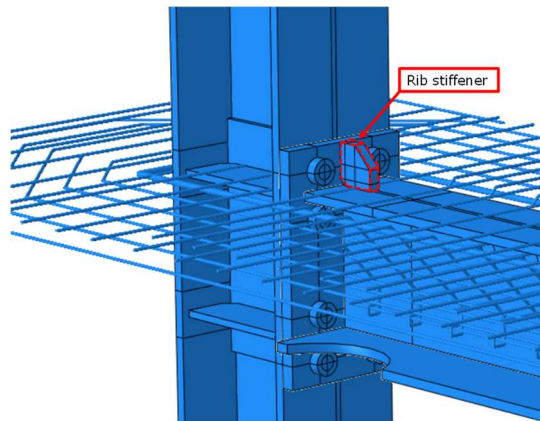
Model M_{11} with welded rib stiffener on the top flange of the SF beam
